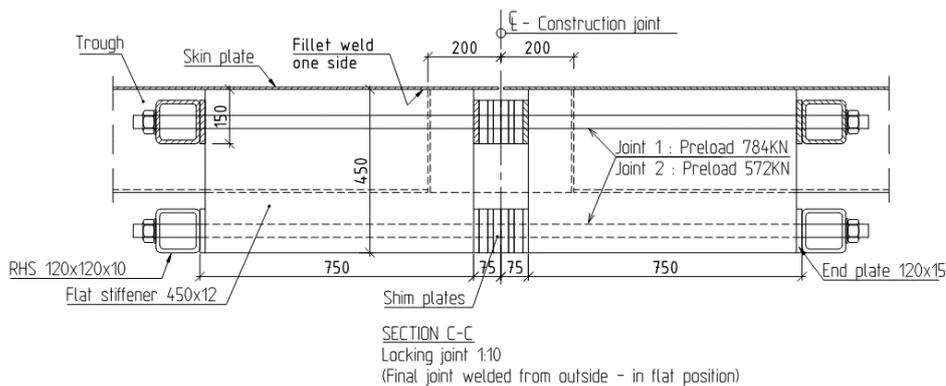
Locking joint for deck plate, construction joint 1 & 2, longitudinal section
